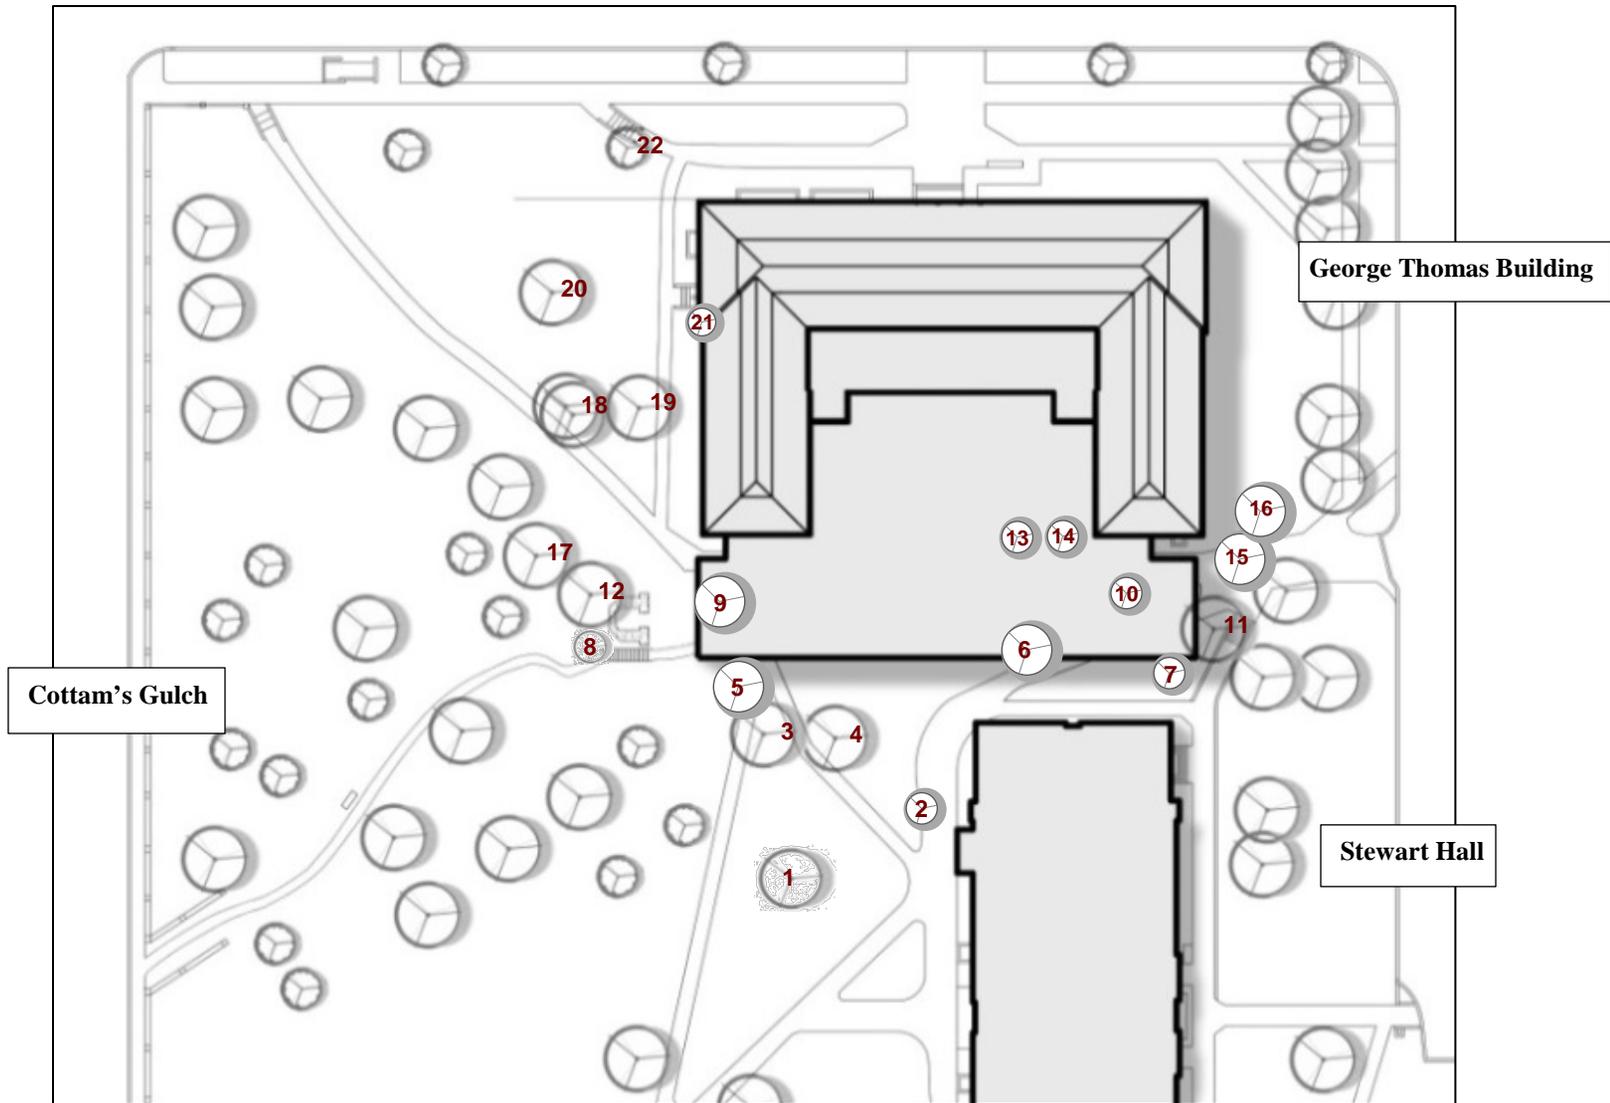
Plan of the landscaped area around the George Thomas Building with the proposed addition shown. The locations of existing trees that may be impacted by the addition or related construction activities are numbered. See Table 15 for available information on these trees.
